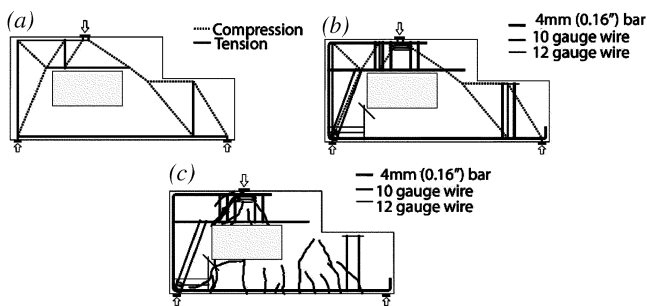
Specimen 4i: (a) STM; (b) reinforcing layout superimposed on STM; and (c) crack pattern at failure superimposed on reinforcing layout.
